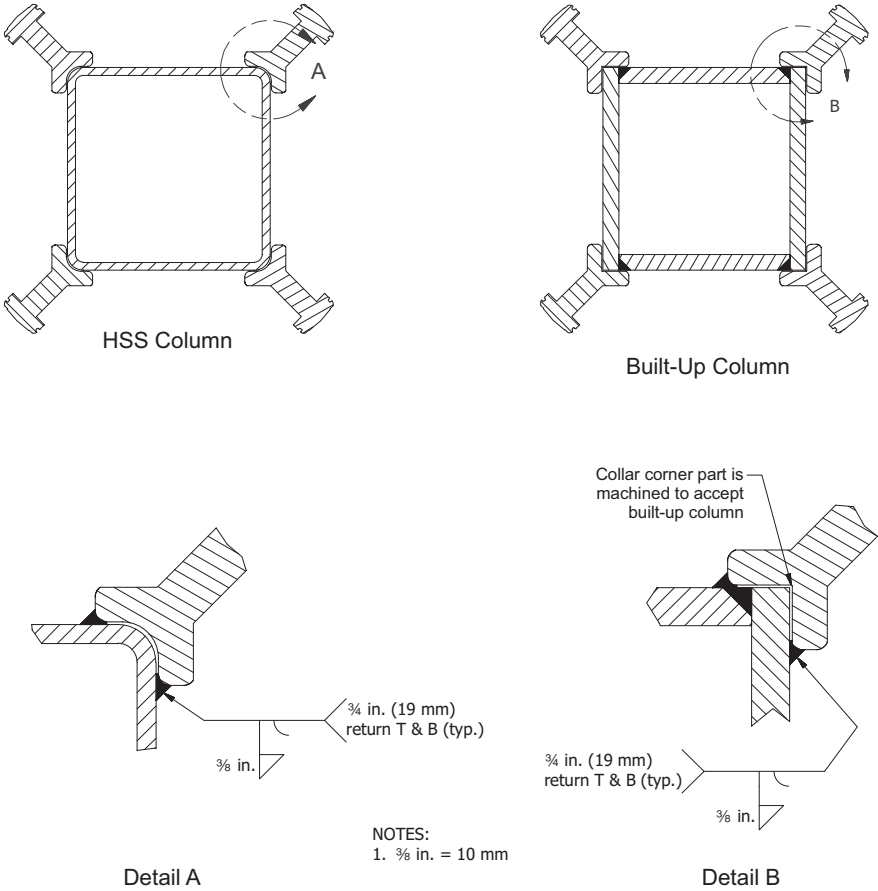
Collar corner assembly-to-column weld, plan view.
